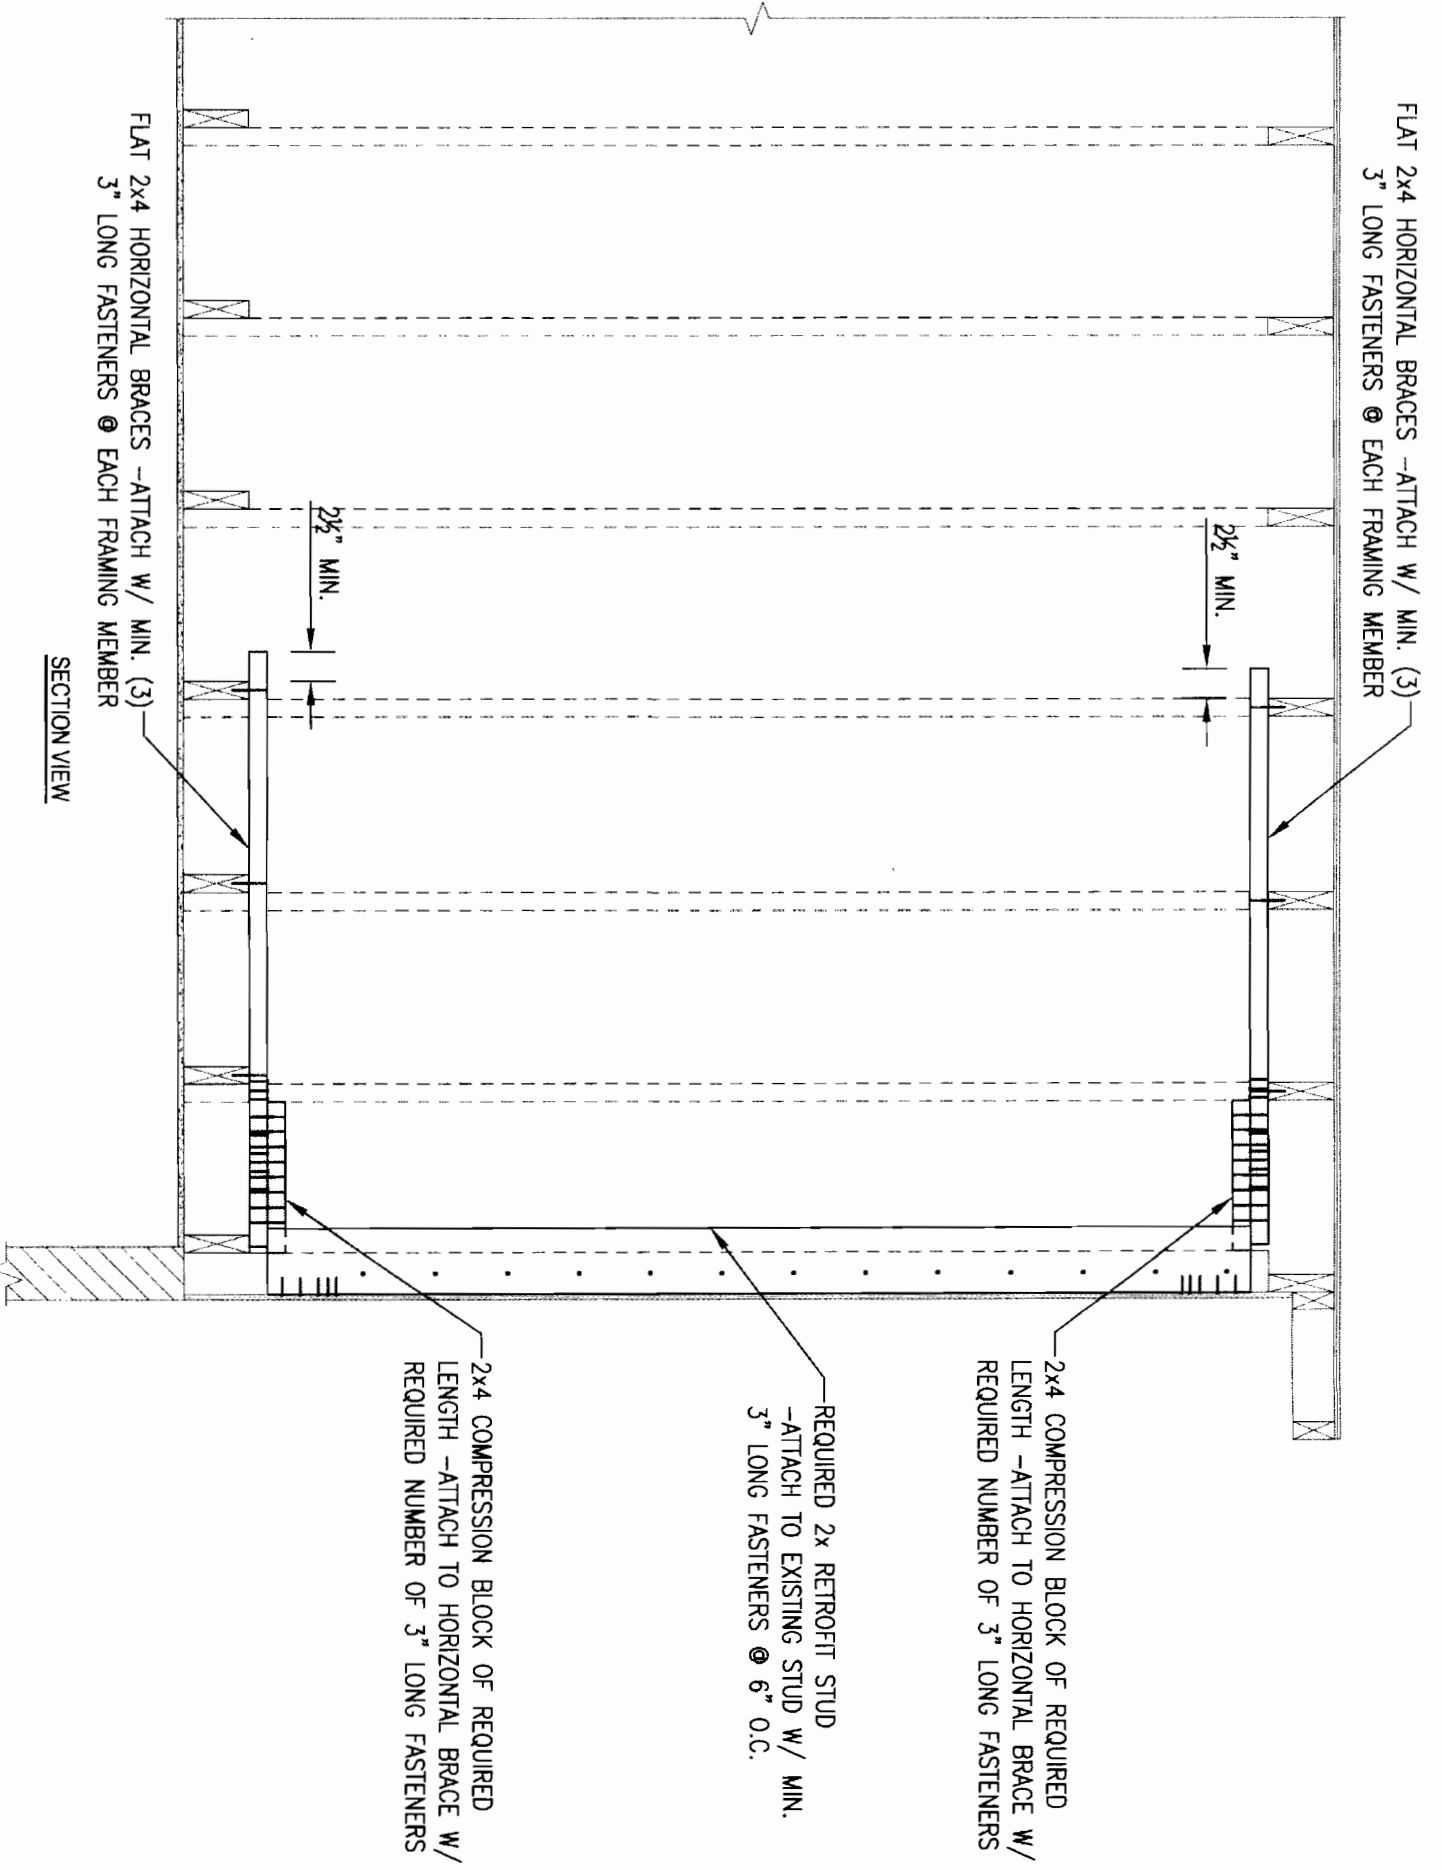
DETAILS OF STRAP & COMPRESSION BLOCK INSTALLATION - (2)2x8 RETROFIT STUD
